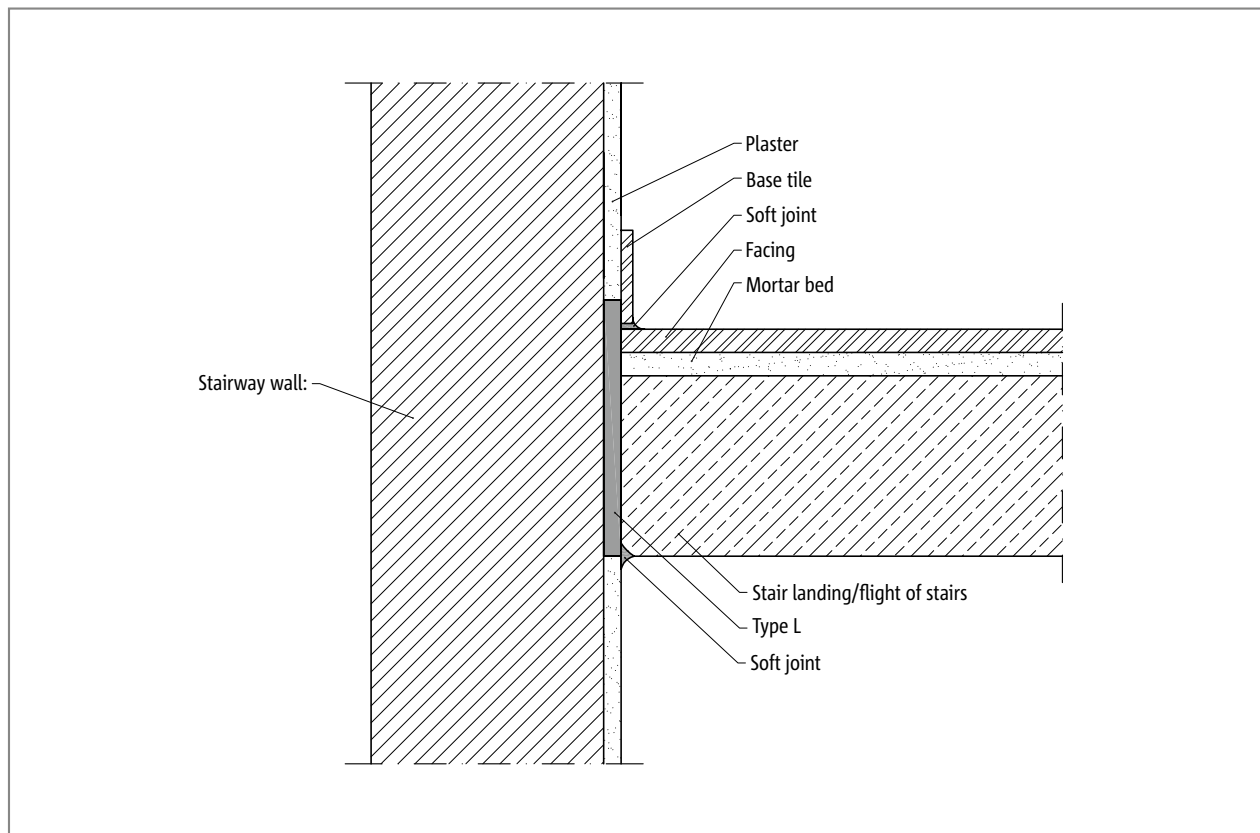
Schöck Tronsole® type L: Installation cross-section in-situ concrete stairs
